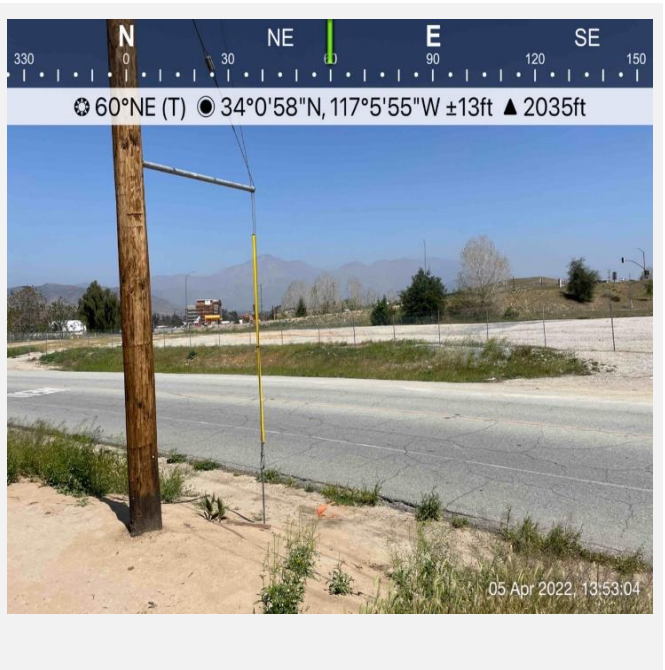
View of paved road in northwestern portion of the Project site, facing northeast.
